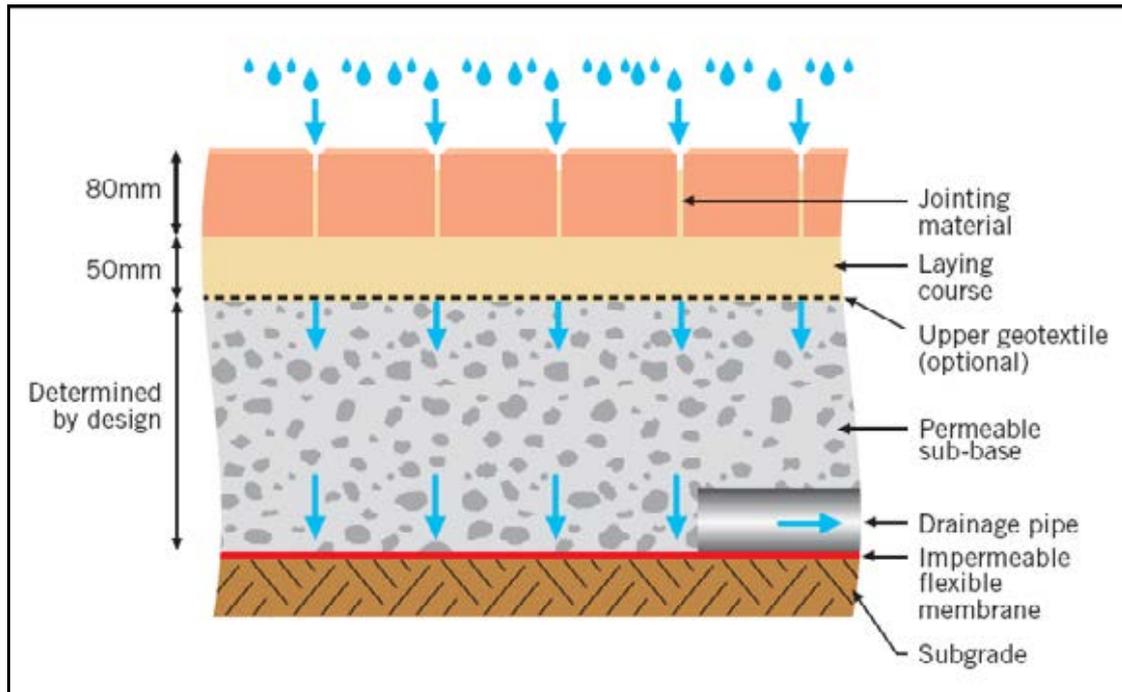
Section through a permeable surface (Source: Interpave *Permeable pavements – guide to the design construction and maintenance of concrete block permeable pavements* dated 2010)
